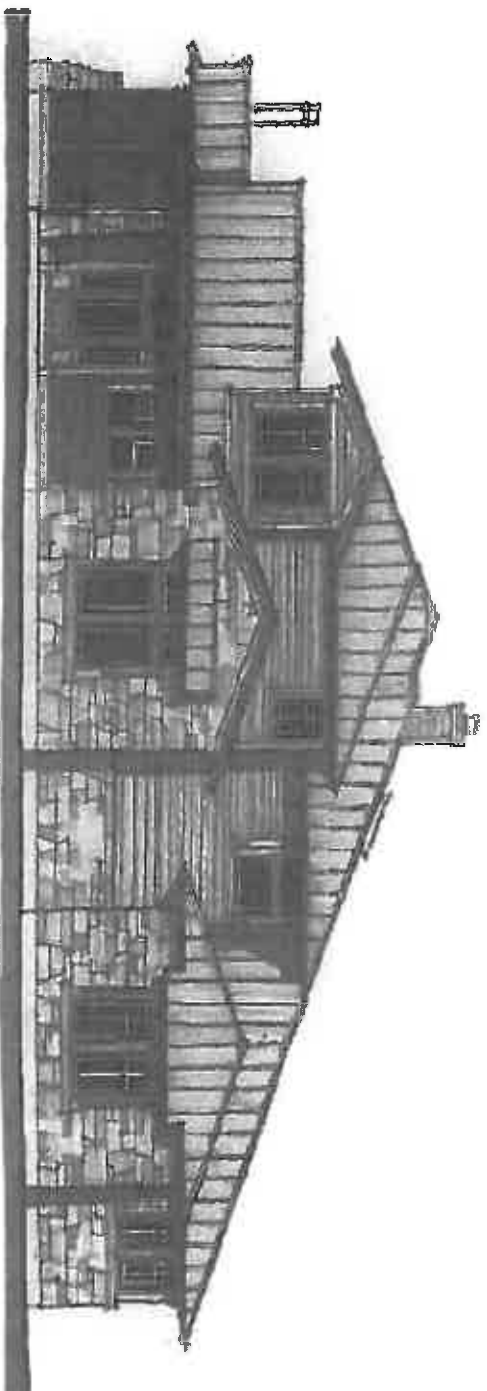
The home above includes projected and recessed building walls, stone veneer, horizontal siding, a covered porch, substantial window frames, and a standing seam metal roof, consistent with its modern architectural style.
